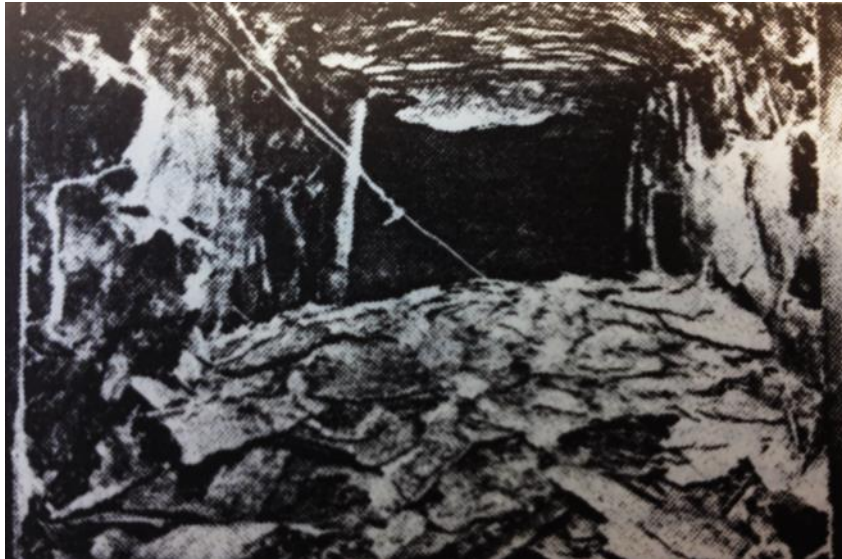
Thermal spalling in an exhaust gas drift at North Bay, Ontario (Lee et al., 1982, p. 964).
